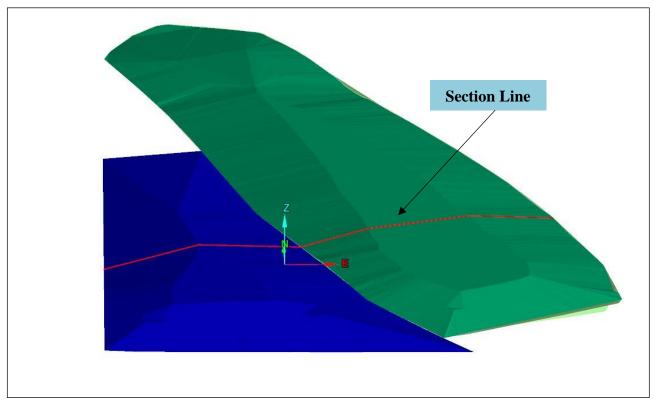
Vulcan South Pit Final Landform Design – North Facing View Showing In-Pit Dump (Green) and Ex-Pit Dump (Blue) Footprints
